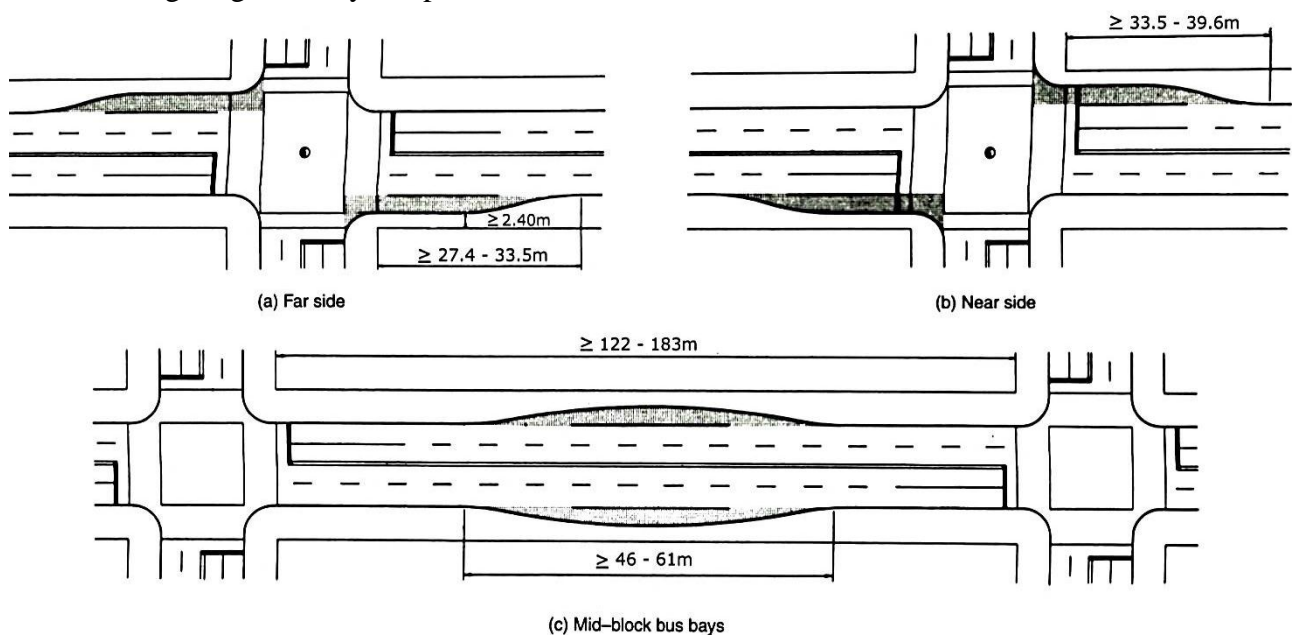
/1: Typical Bus Stop Turnouts on Arterial Streets. [3, p.259]
